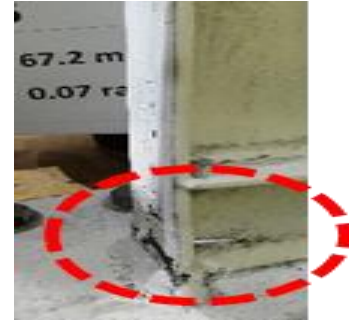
(c), Failure condition: tensile fracture at the bottom flange (specimen LL-0, 10B Cycle).
